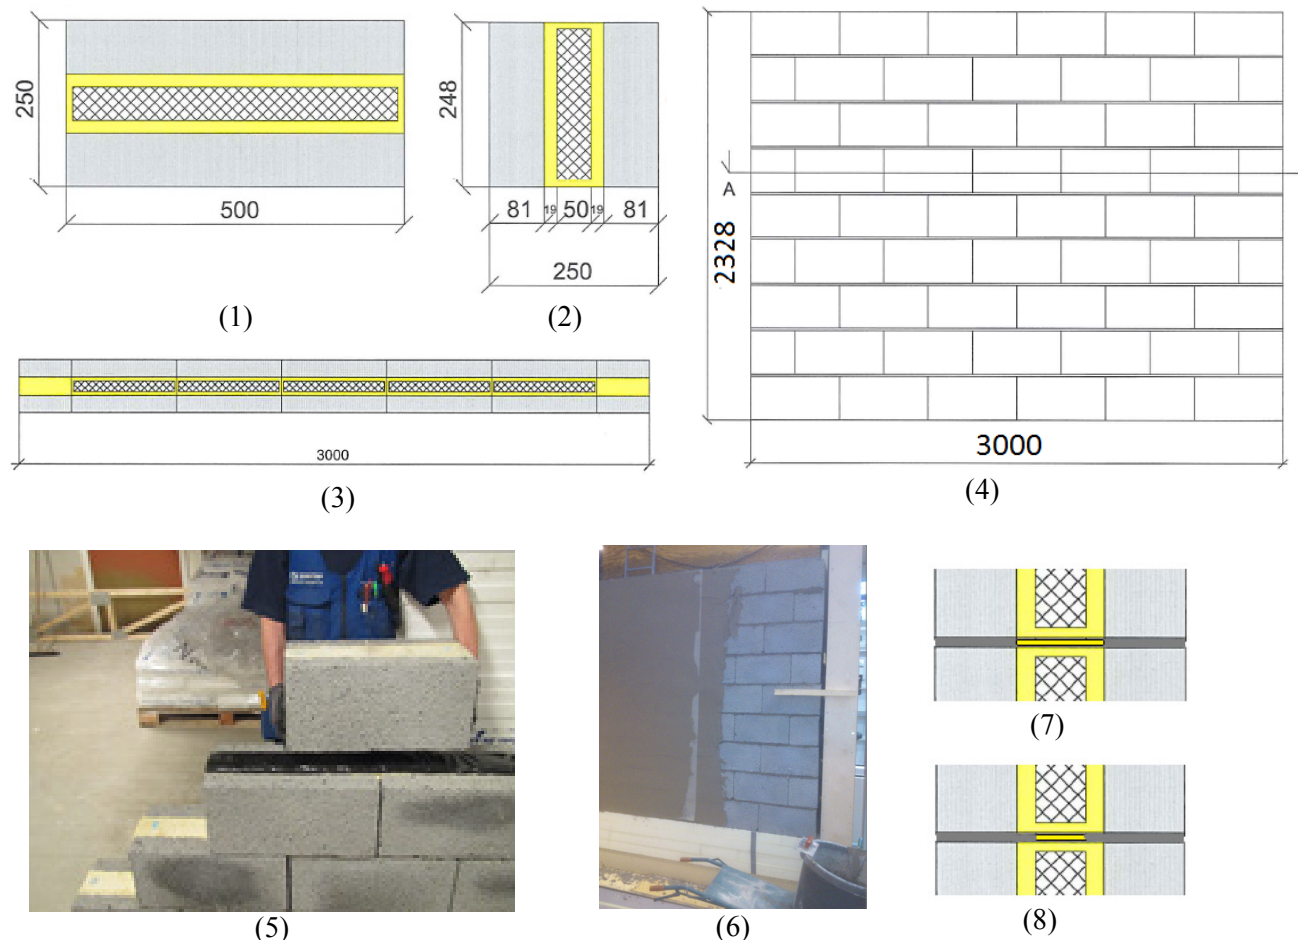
Masonry block system sections and front view (1, 2, 3 and 4), dry assembling of the wall (5), plastering of the wall (6), horizontal joints (7) and possible penetration of mortar in to the insulated space between the two cores (8)
